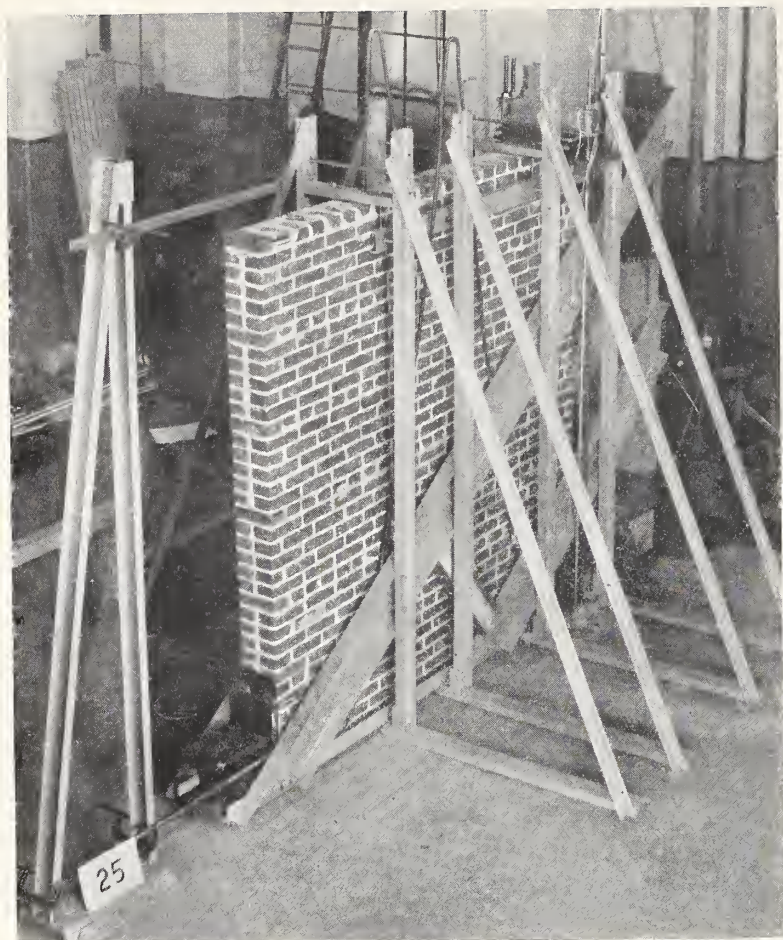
Wall specimen *AC-R1* under racking load.
